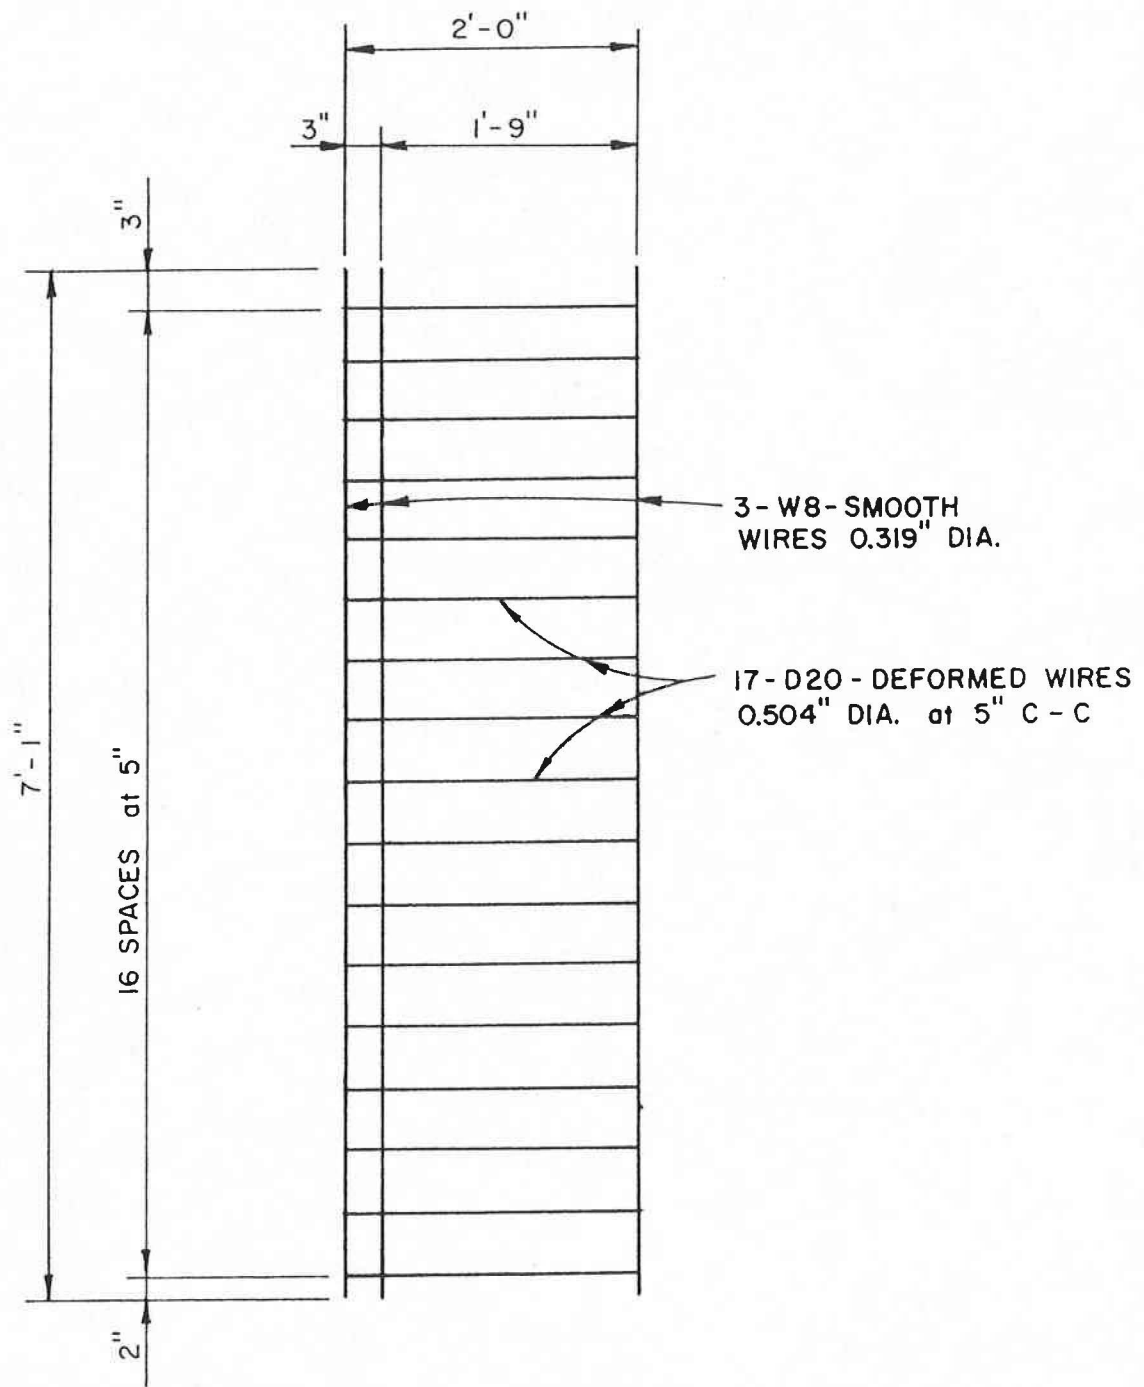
Detail of Special Slab Reinforcement used Under Each Concrete Post.
